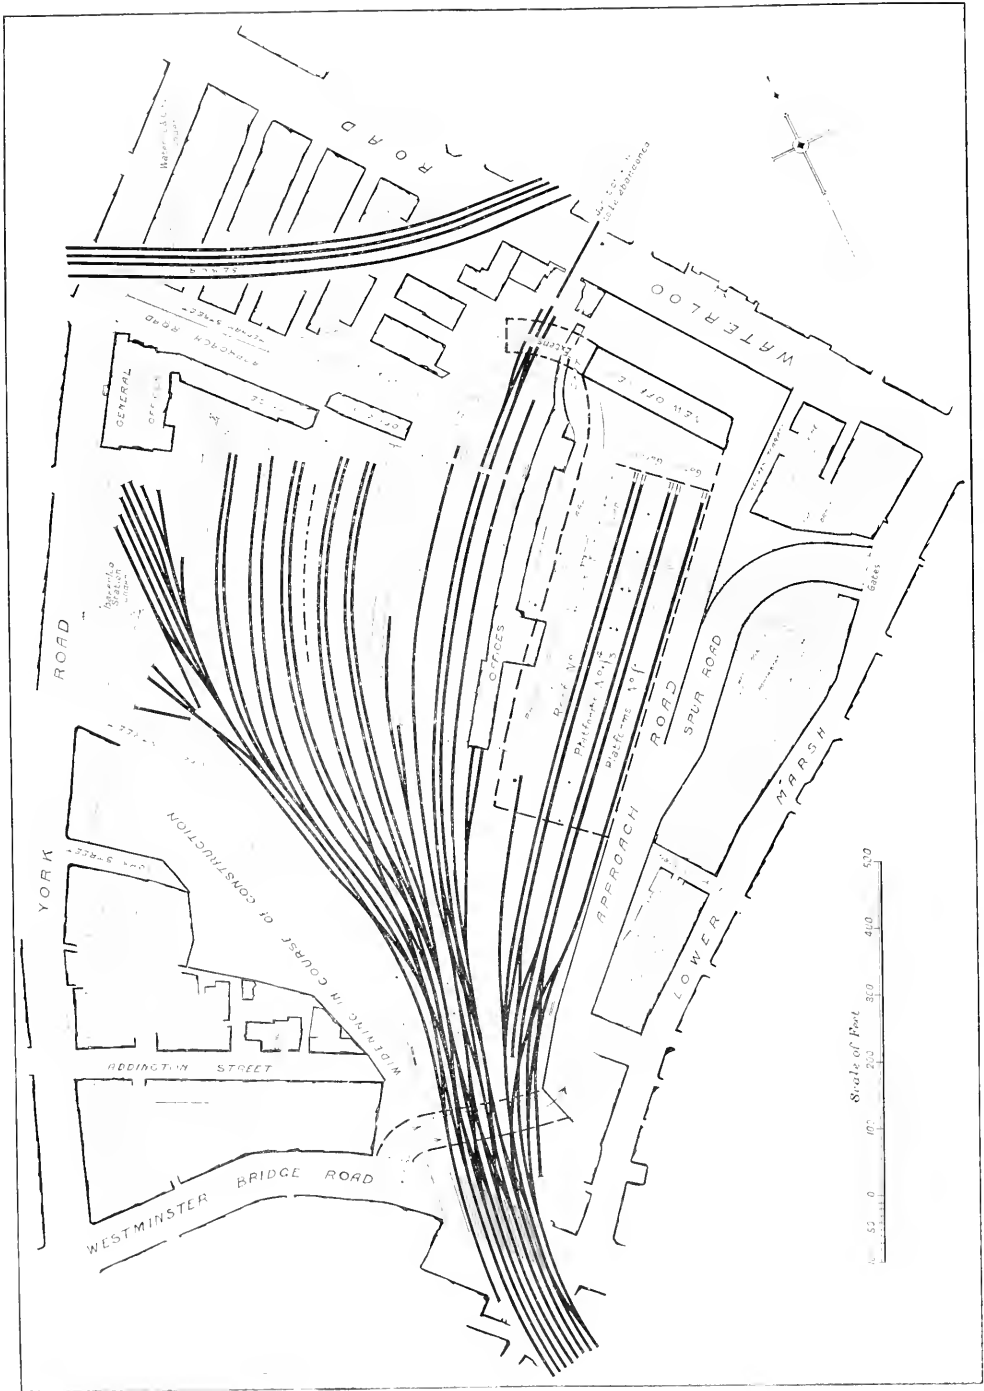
Plan of Waterloo Station—London and South Western Railway.
